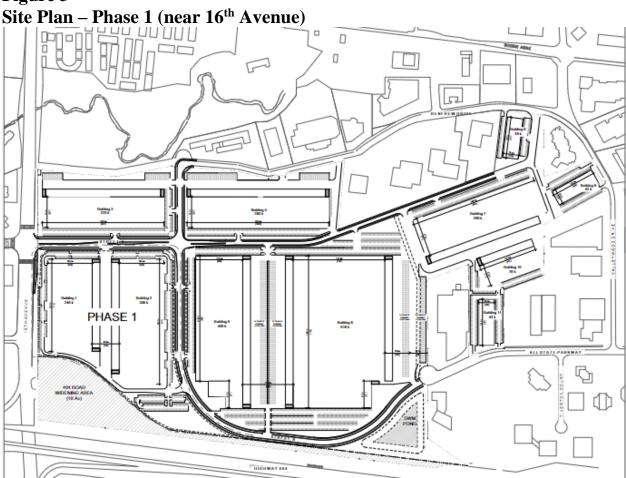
Site Plan – Phase 1 (near 16th Avenue)
